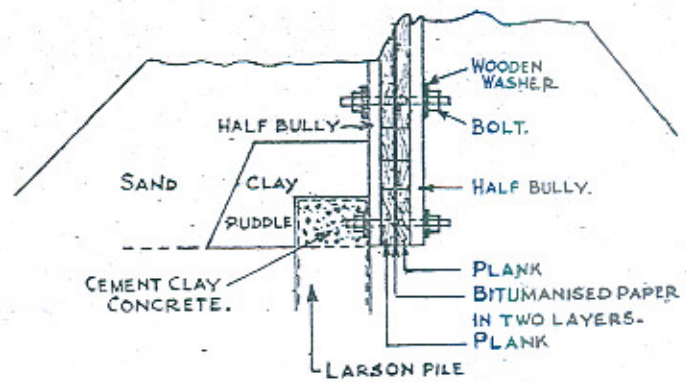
Sketch showing junction of Larson and Timber Piles in the concrete coffer dam used in Kuanting Dam.
